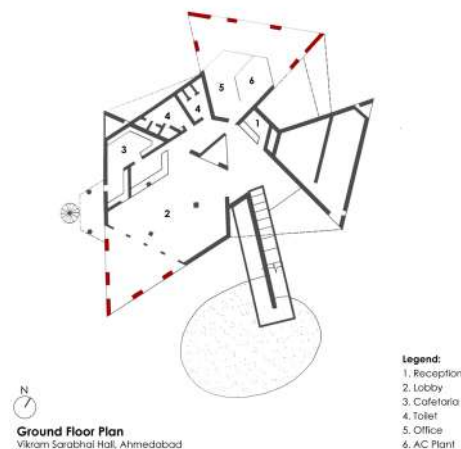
Ground Floor Plan showing the placement of the brick columns.
